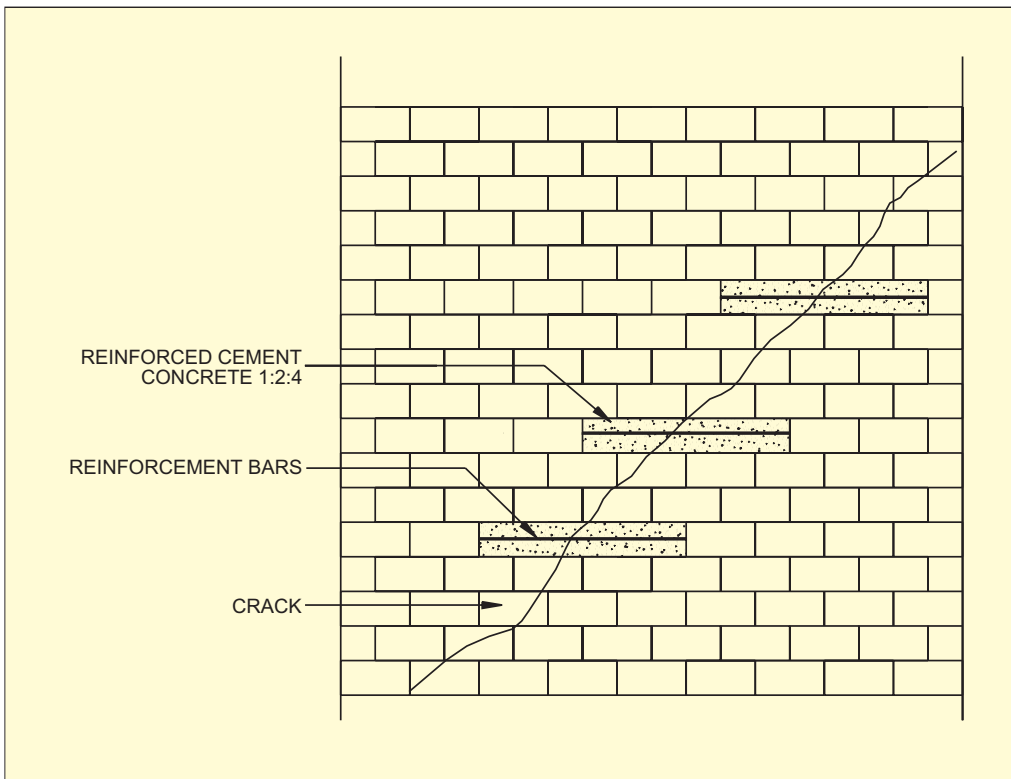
(b) Elevation of Brick Masonry Wall Showing Typical Cracks (Vertical or Diagonal)
